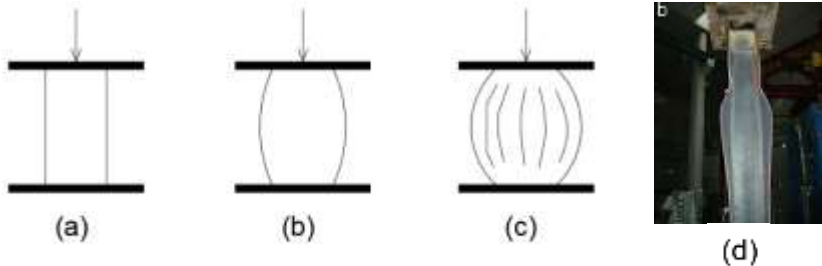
Compression failure of a stocky column. (a) before the loading, (b) during the loading, (c) failure, (d) illustrative photo from Correia [15].
